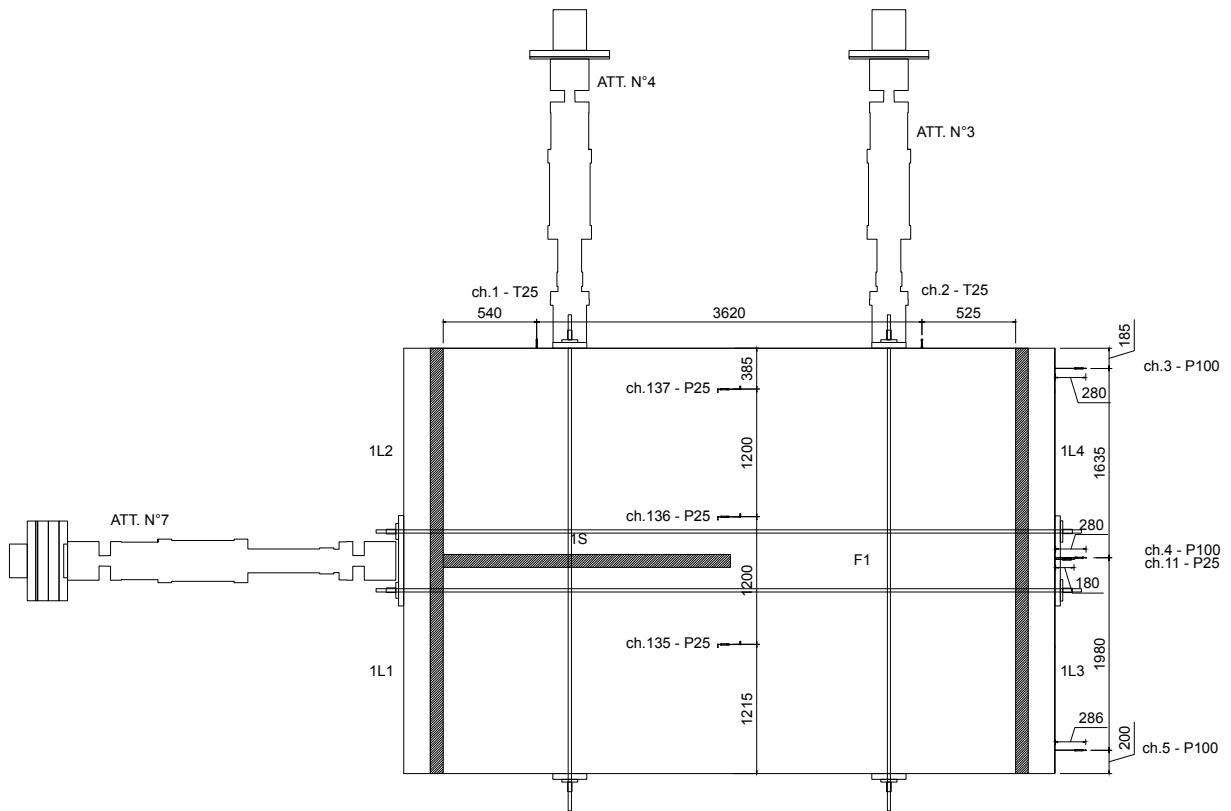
Schematic of the installed instrumentation: plan view of the specimen – Floor Slab, 1.
